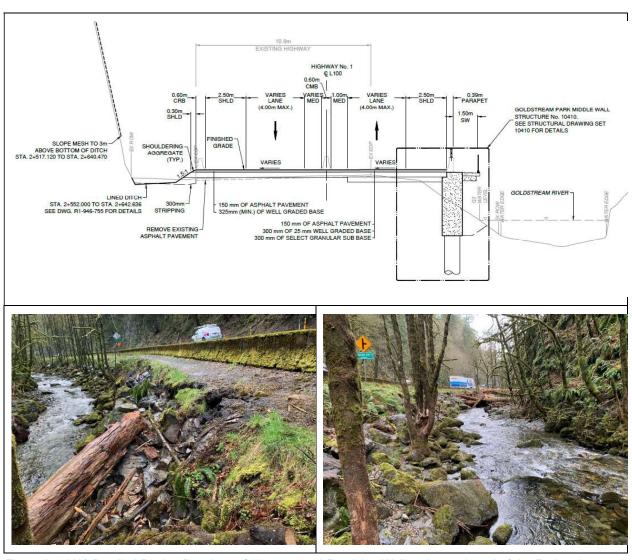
100% Detailed Design Drawings of the proposed Retaining Wall at the north end of the Project (top row). Boulder and debris jam located at the downstream end of the proposed works (left photo – facing upstream, right photo – facing downstream). Debris jam and boulder were removed in May 2020.
